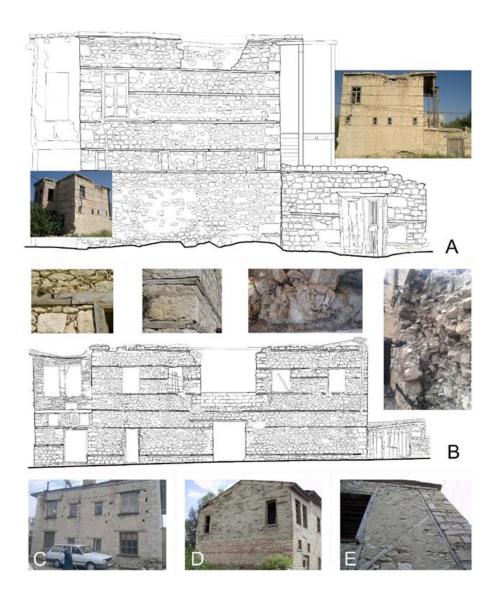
Examples of stone masonry wall with timber bond beams and details: Northwest façade of Hacer Şişik House (A), South façade of Ali Manav House and details (B), Examples of Stone masonry without timber bond beam (C), Timber framedunfilled-timber lathed (bağdadi) (D), Timber framed-infilled (hımış) (E)
